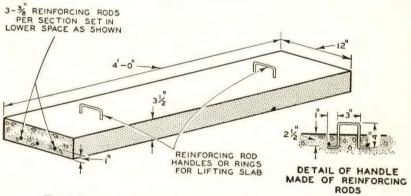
Detail of One Section of Cover Slab for Concrete Septic Tank
